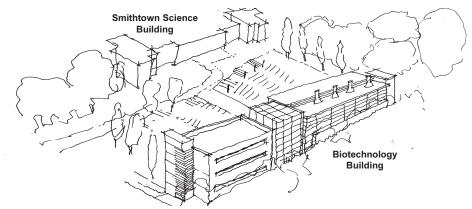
Conceptual sketch of The Biotechnology Building and adjacent buildings.
